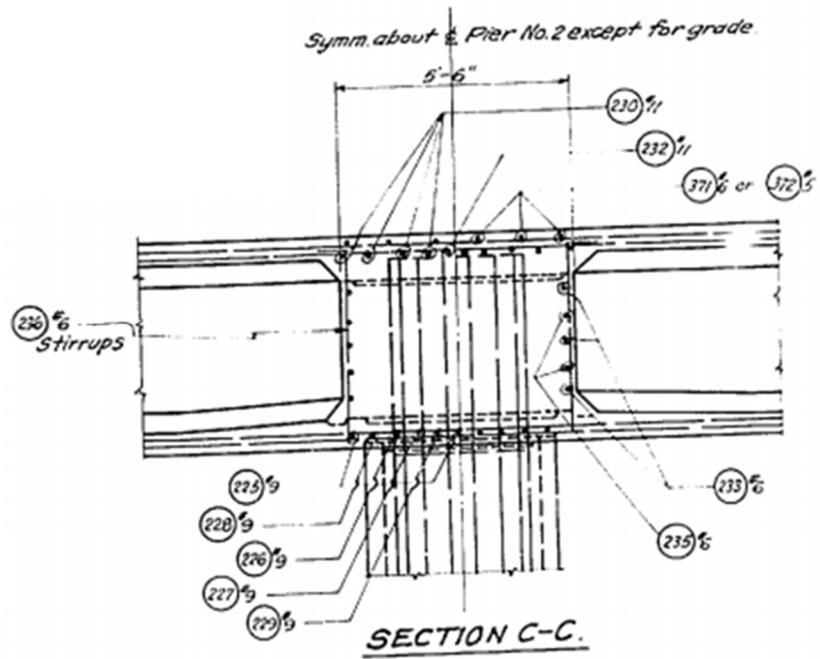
Cross Beam cross-section for Typical Bent (Green River)
